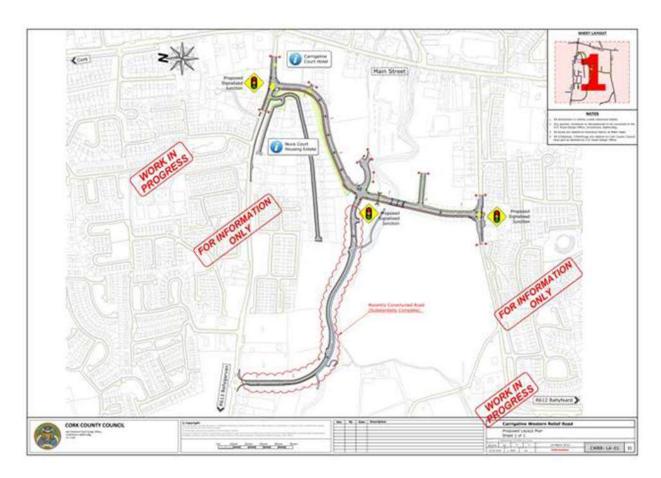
Proposed layout of the Carrigaline Western Relied Road
